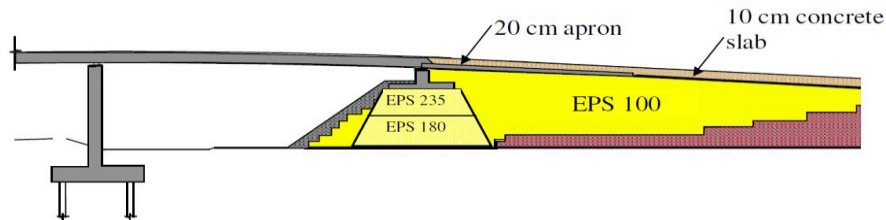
Principal sketch for re-foundation of Hjelmungen bridge
